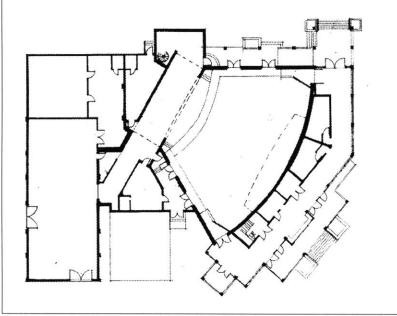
Plan of Surflight Theatre, Beach Haven, NJ
